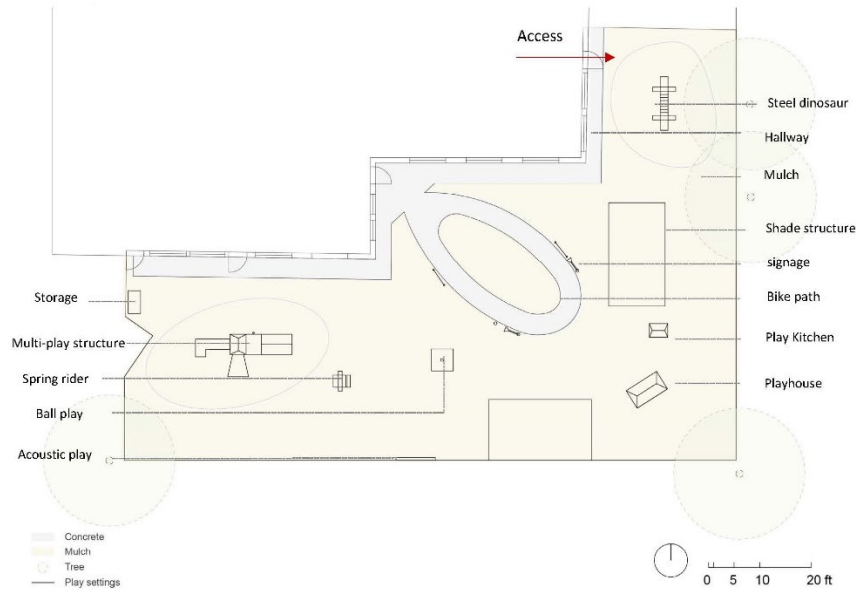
Outdoor Play Environment Site Plan: SOPE.
